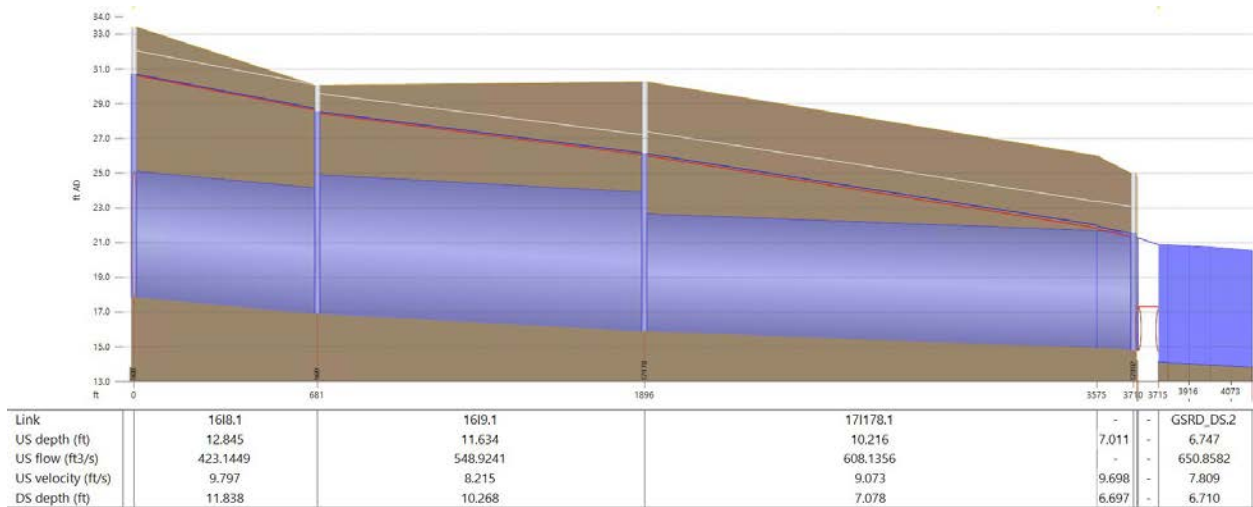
Site 5 (Stonehurst Outfall) 100-year Pipe Profile (Clean Facility)
